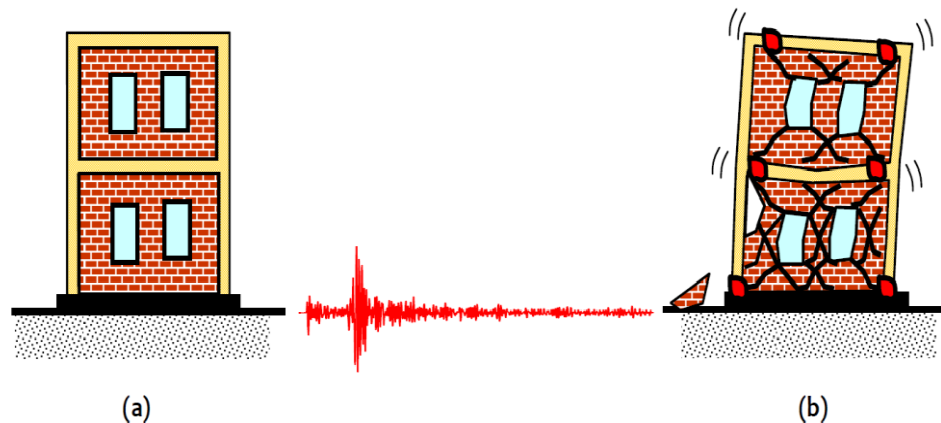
An earthquake in normal constructions (a) undamaged building, and (b) damaged building.
